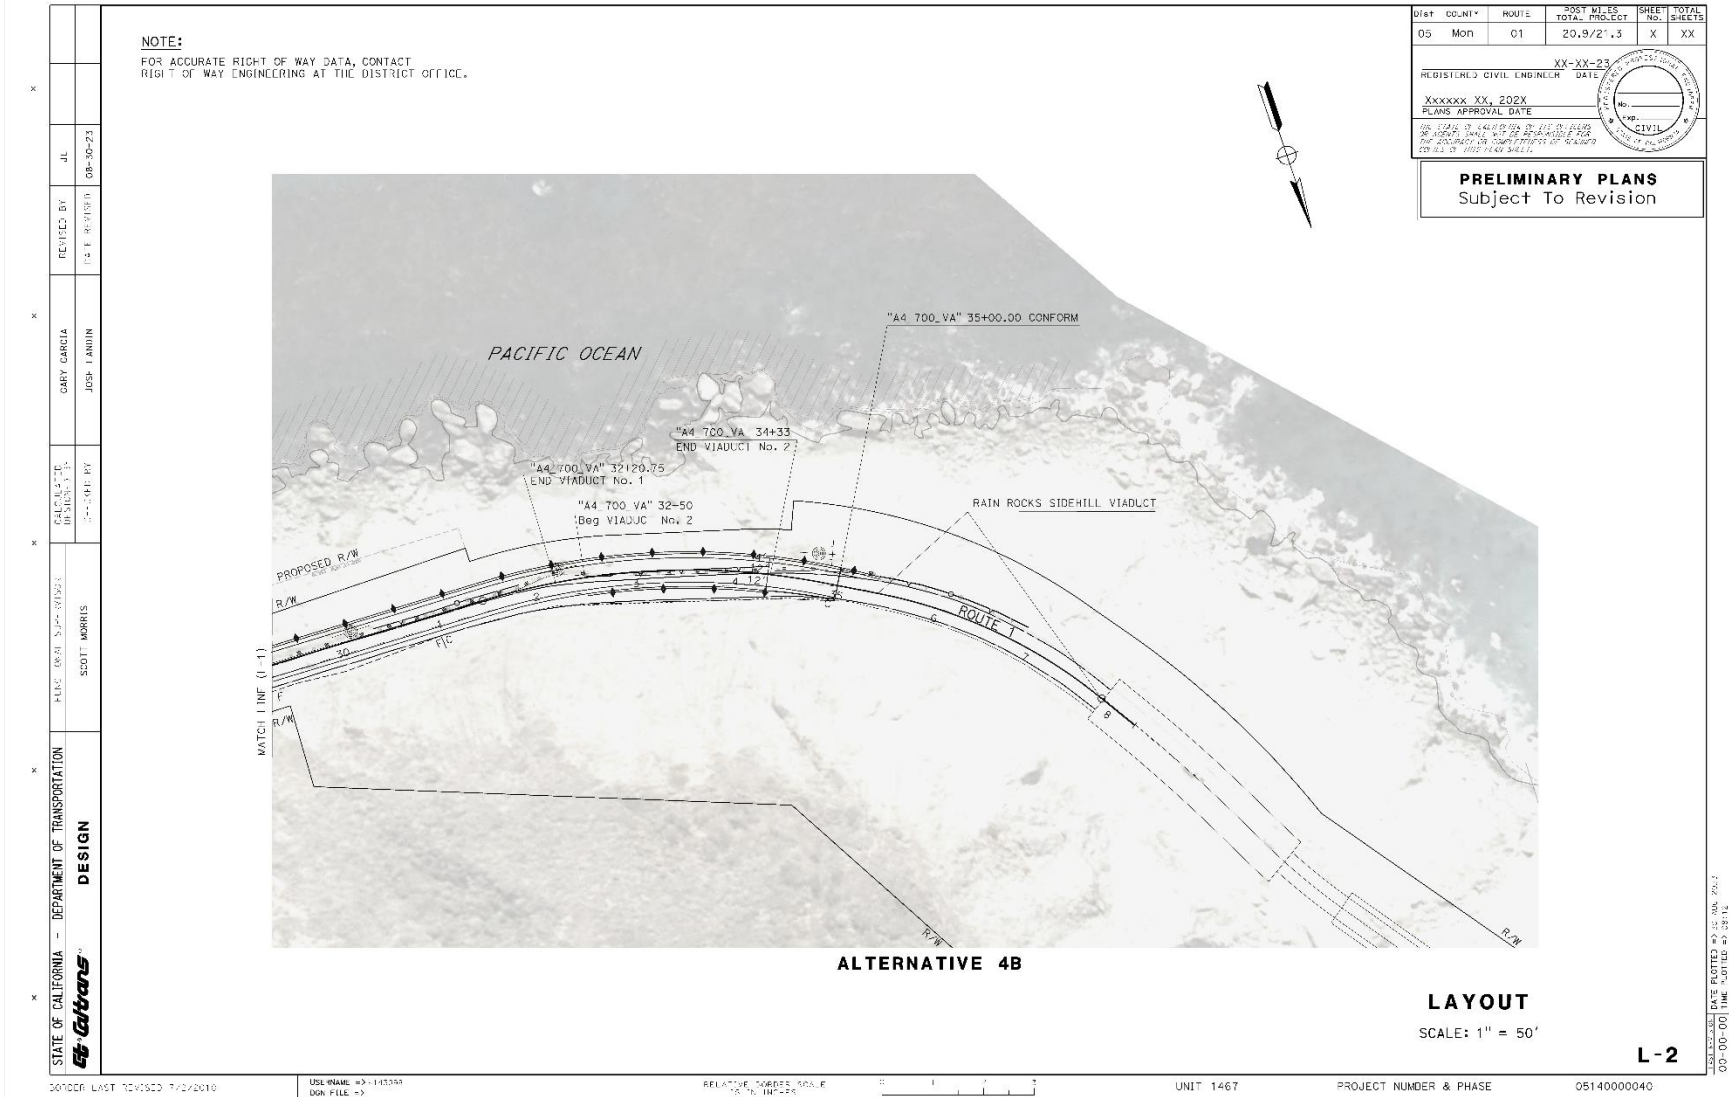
Alternative 4B Preliminary Layout Sheet 2
